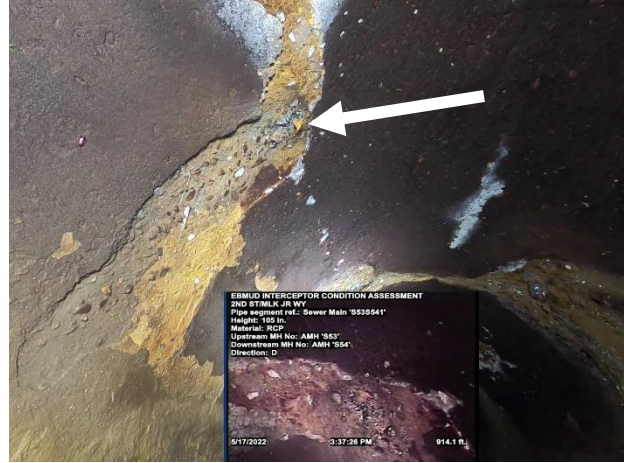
Small void with dripping infiltration at 914 feet downstream of S53
